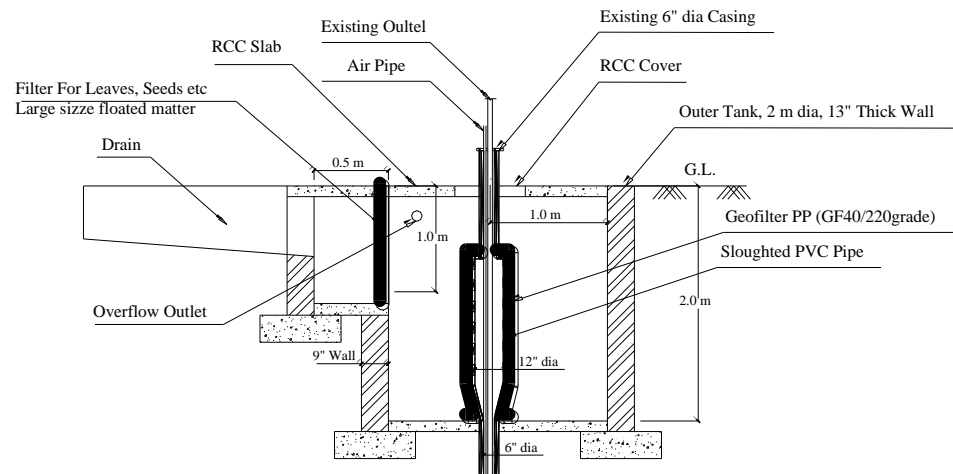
Plan showing Existing Structures & Bores With Proposed Recharging system. (Bore - 1)
